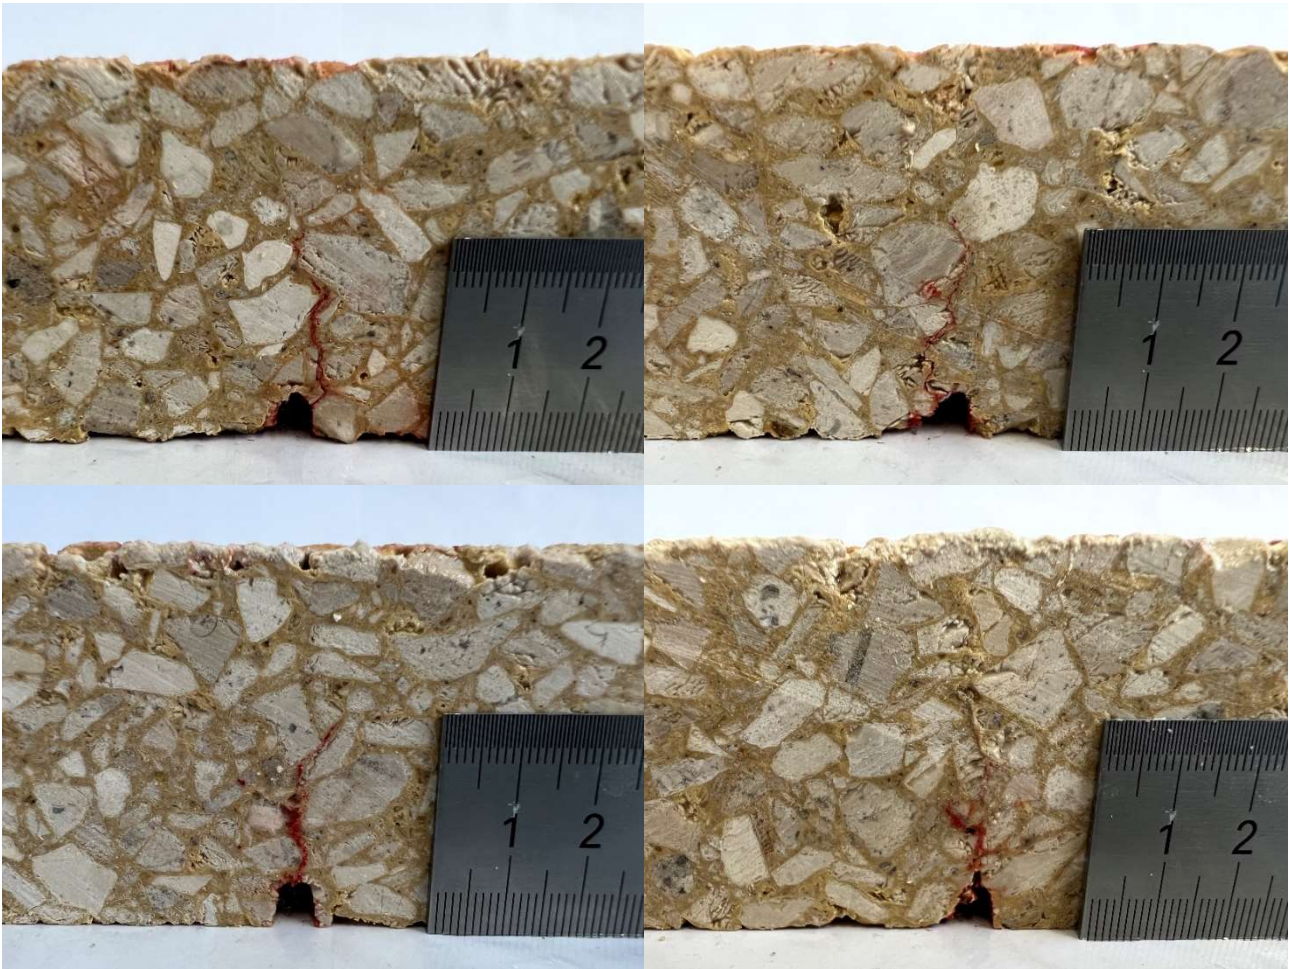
Photographs of the cracking in the SMA Low Damage Level beam
